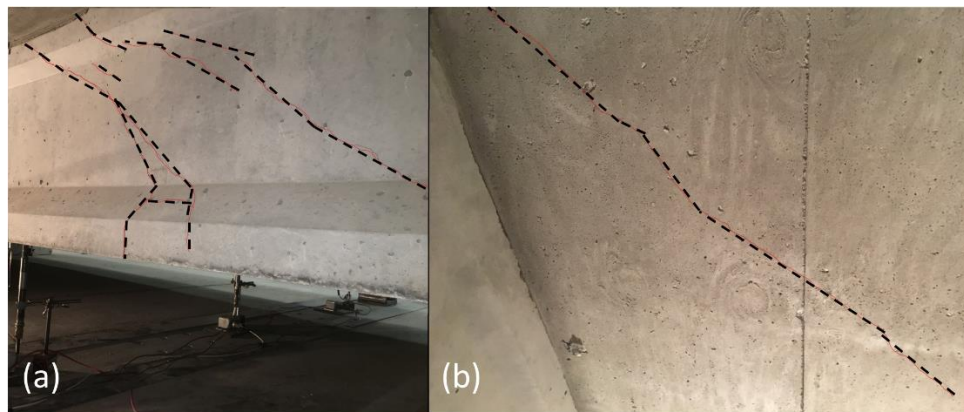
Bond-shear crack in the loaded girder (a) and diagonal crack in slab (b)
